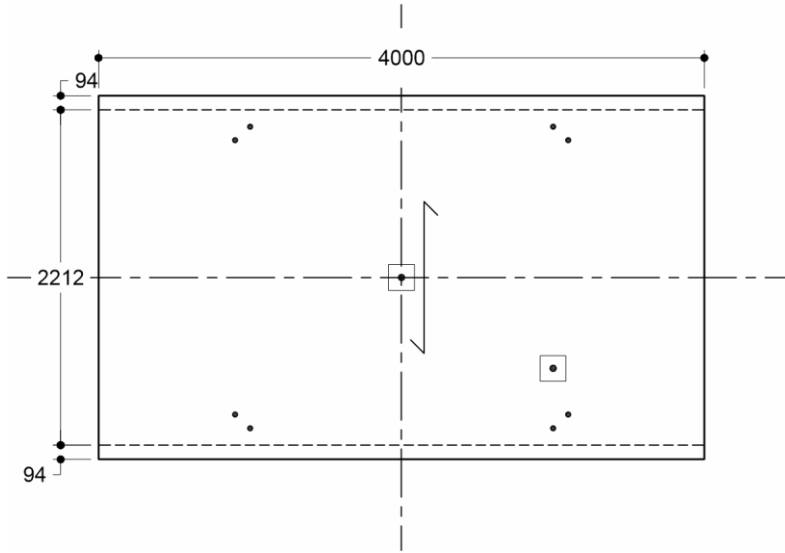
One-way short span platform construction (Assemblies L and O)
